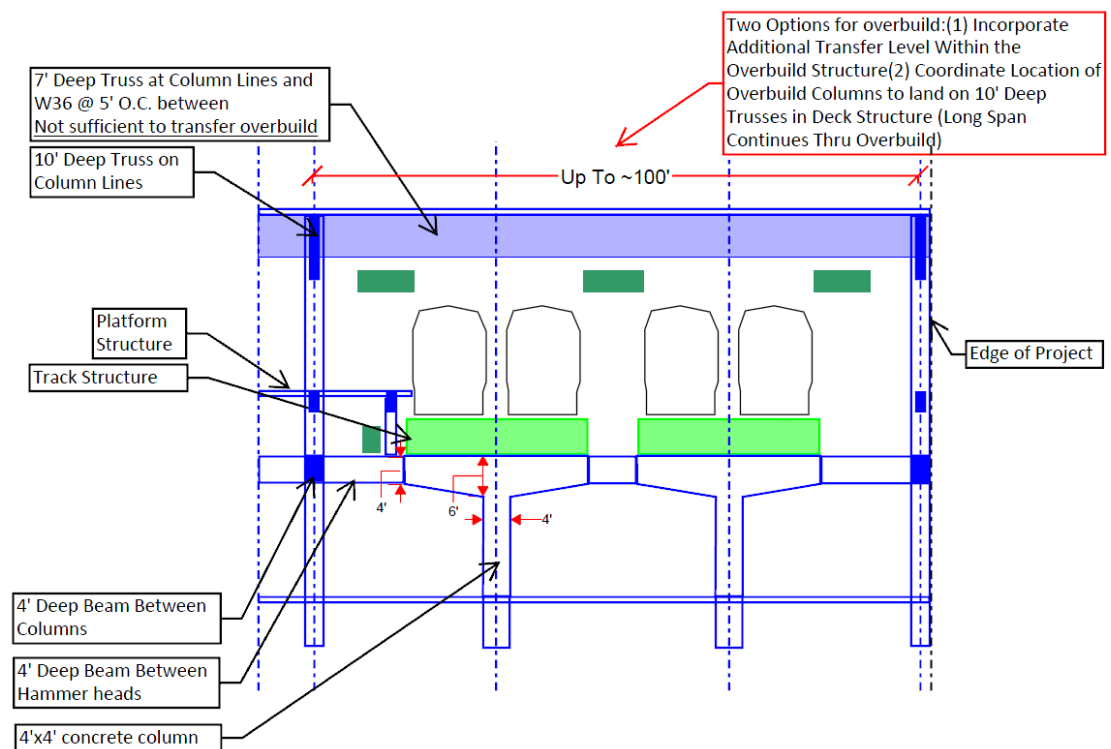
SECTION THROUGH LONG SPAN FRAMING ZONE
